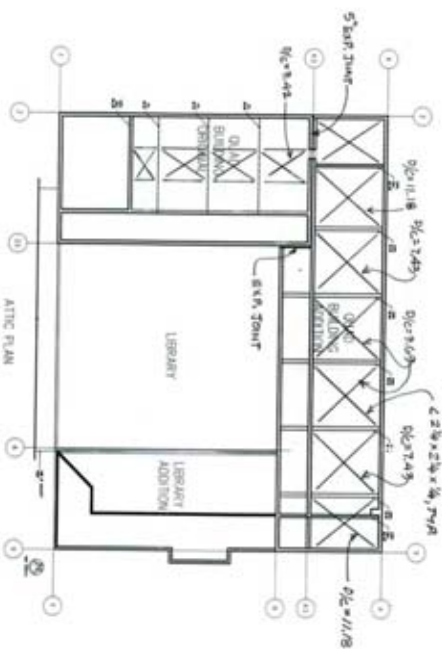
Attic plan of Quad building showing demand to capacity ratios (D/C) for attic diaphragm tension bracing.
